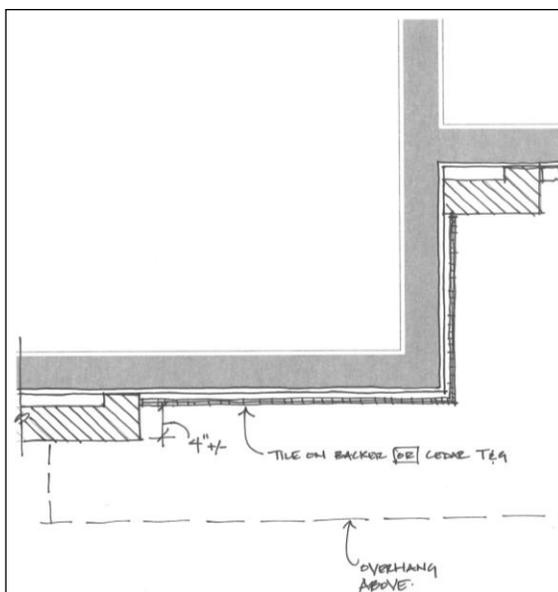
Detail drawing of how and where the accent tile or cedar inlay will be installed.
